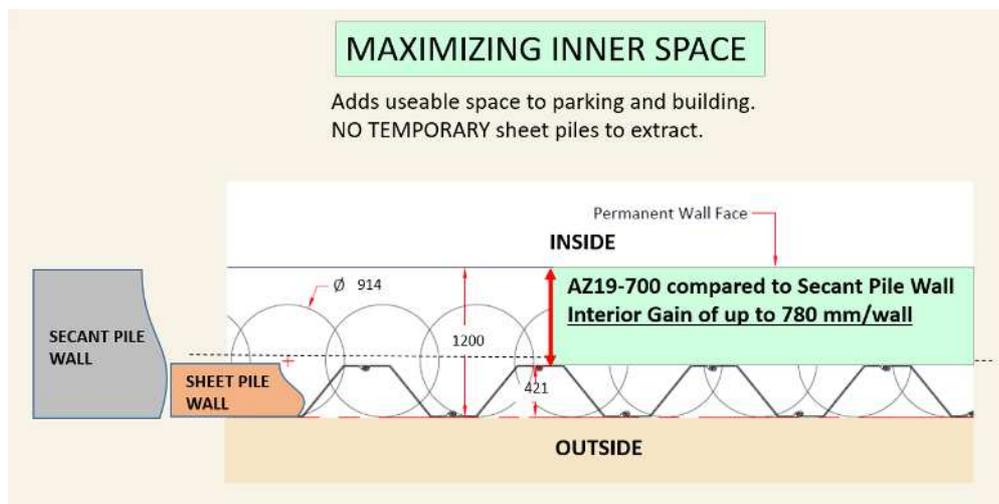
Larger inner space with sheet pile wall than with secant pile wall
